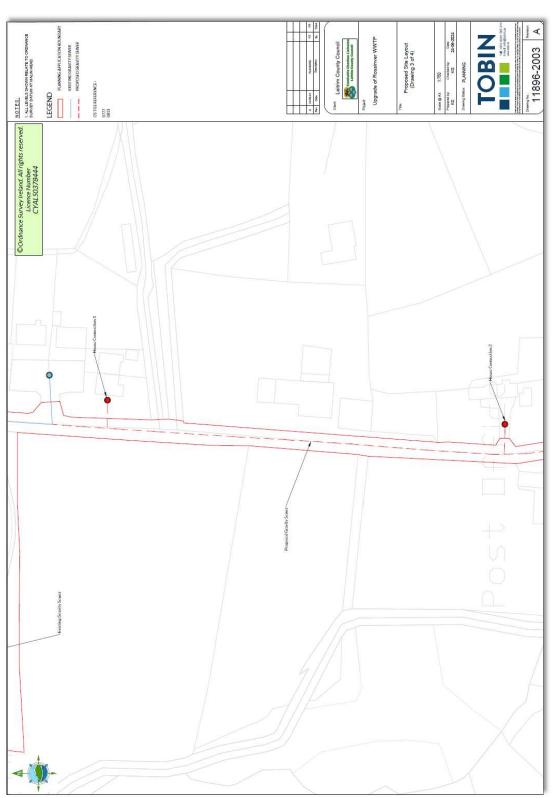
Proposed gravity sewer route to proposed pumping station at Gublaun estate (not to scale), see planning drawing ref 11896-2003.
